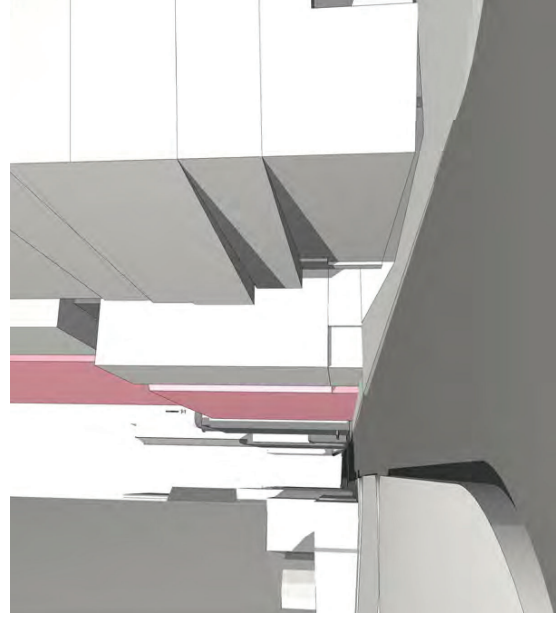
View 2 Pitt St Looking South - Proposed Envelope
